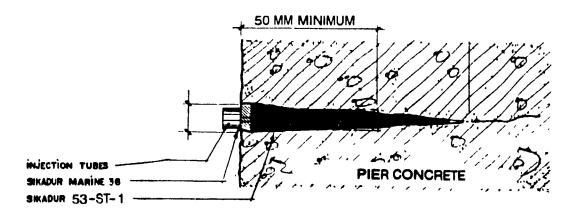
REPAIR OF WIDE CRACKS
